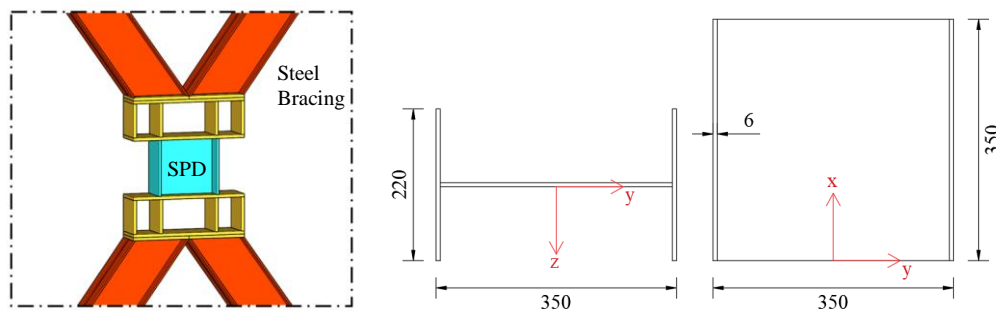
Shear panel damper (SPD) element added to the steel bracing in PSSV structure
